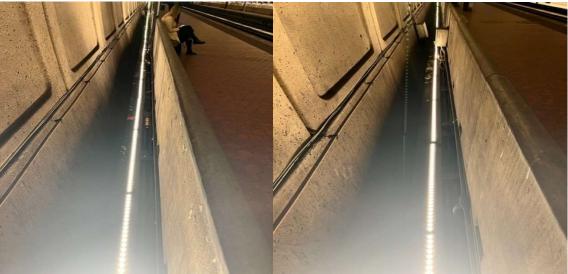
Photos of trash behind Parapet Wall Track 1 side
